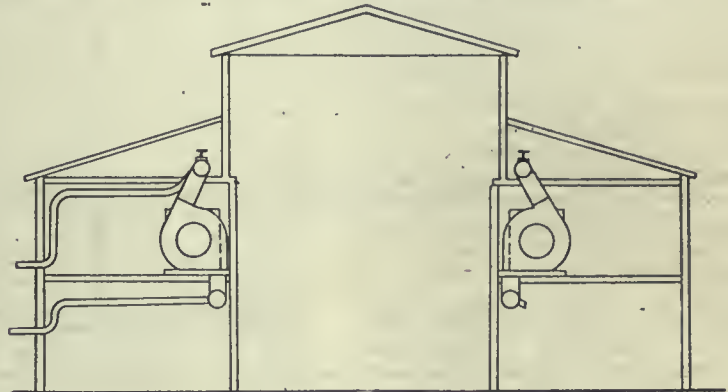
CROSS SECTION OF FOUNDRY HEATING SYSTEM.
